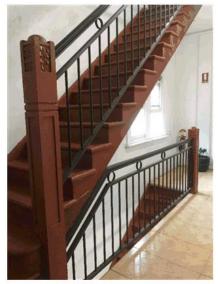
Stairwell and staircase with simple decoration to newel post and metal balustrading.
